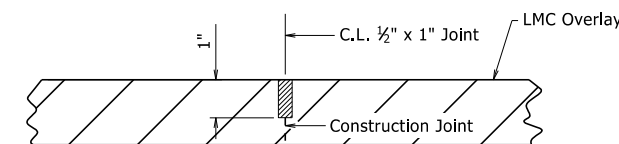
DETAILS OF HYDRODEMOLITION AND LATEX MODIFIED CONCRETE OVERLAY
